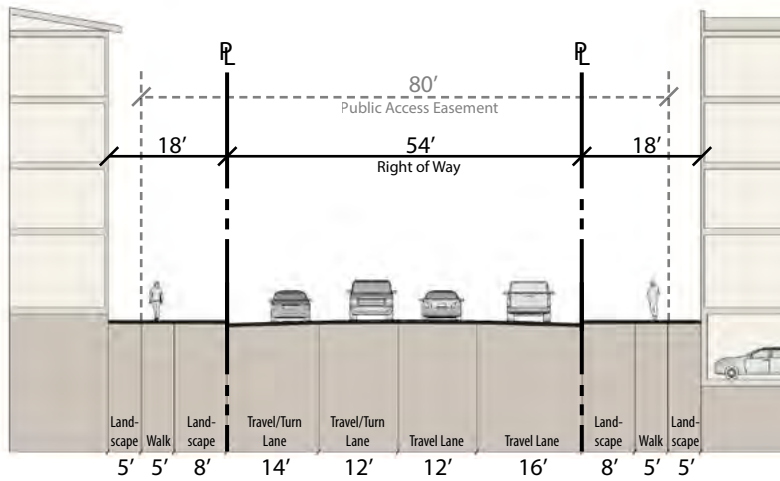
Section C - Entry Drive (without diagonal parking)
